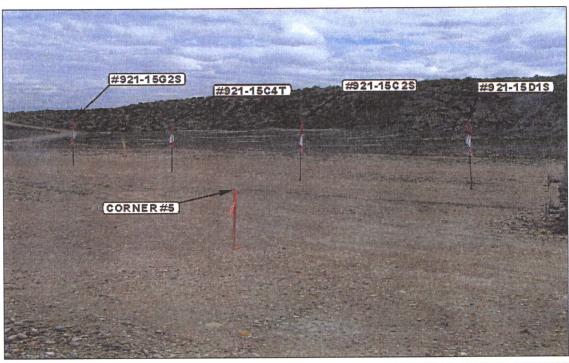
PHOTO: VIEW FROM CORNER #5TO LOCATION STAKES
